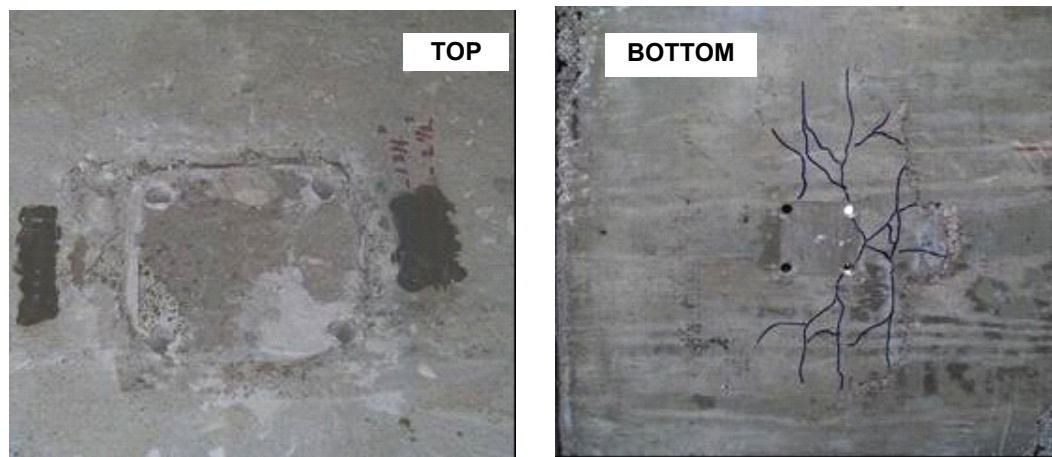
and Figure 3.11 show the top and bottom surfaces of specimens after testing. The holes that were used to connect top and bottom steel base plates can be seen in these pictures. Figure 3.10 illustrates that that punching failure occurred locally around the connection area for specimens CC and CE and slab-column connection under the steel base plate remained relatively undamaged. Cracking on the bottom surface was more concentrated on the side where unbalanced moment was acting for specimen CE (marked lines in Figure 3.10). For specimens CC and CE, failure took place in a brittle punching mode when the steel column was pushed into the slab locally around the connection area.
